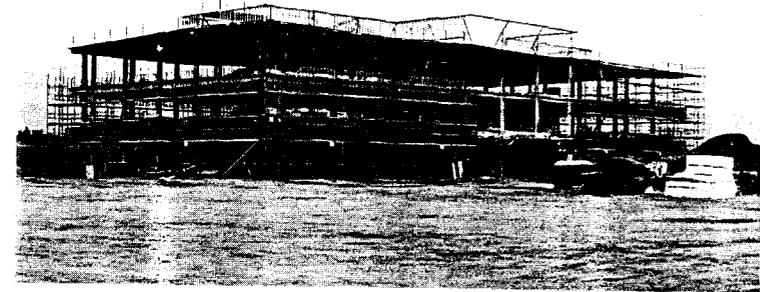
This steel-frame structure has no diagonal bracing or shear walls, and thus would be classified as “flexible.”
